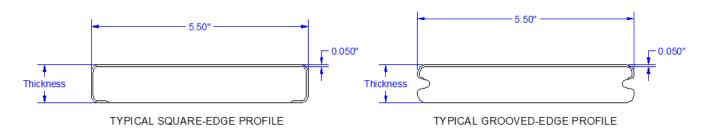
TYPICAL TREX® DECK BOARD PROFILES
